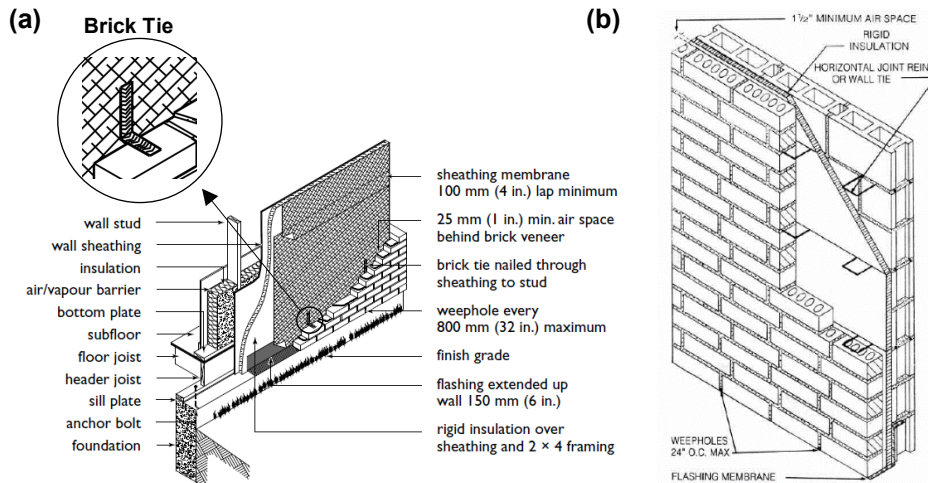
(a) Masonry veneer support cross section (Burrows & Canada Mortgage and Housing Corporation, 2013) (b) typical cavity wall with insulation (Satko, 2007)
